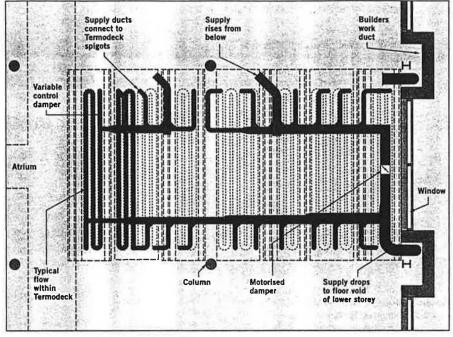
A typical ceiling zone showing how the ductwork connects to the Termodeck slabs. Note the motorised damper which enables mechanically-cooled air to bypass the Termodeck and inject directly into the floor void.
